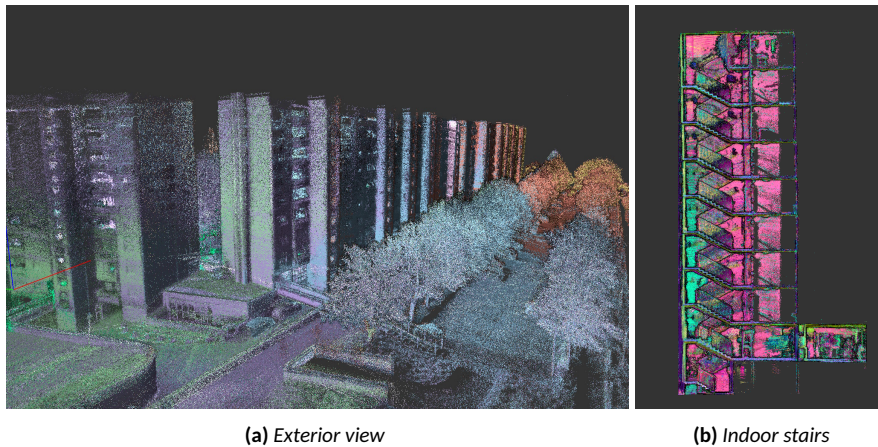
MM building survey: 2 views of the final point cloud, one showcasing the outdoor area and the other highlighting the indoor stairs.
